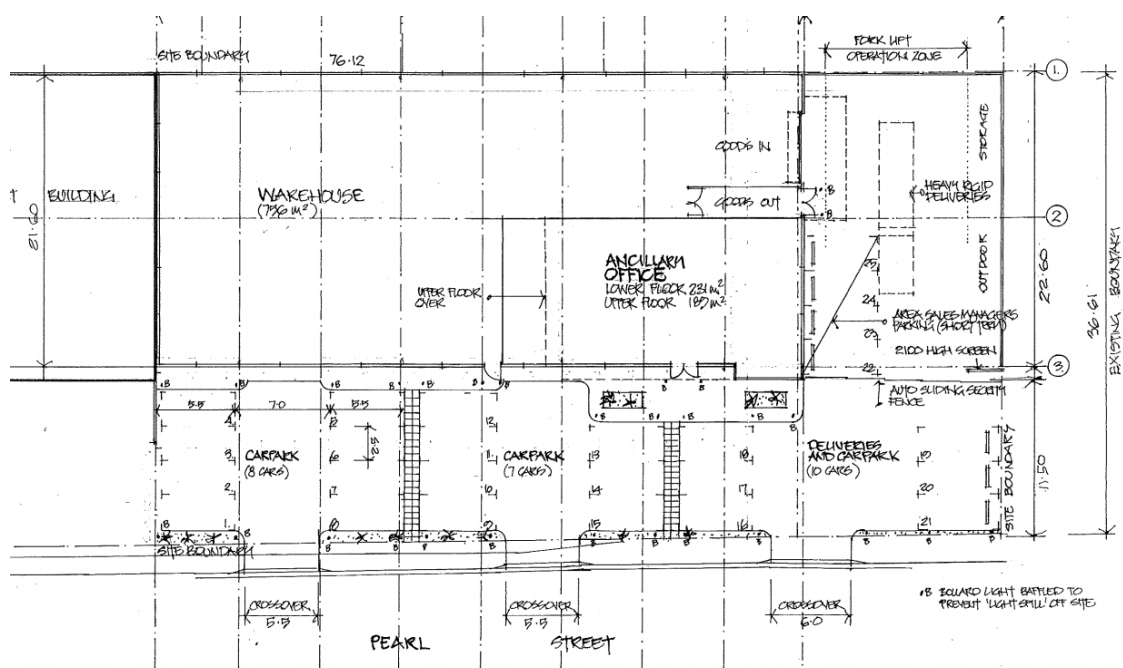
Proposed development site plan – 5-15 Pearl Street, Derwent Park.
